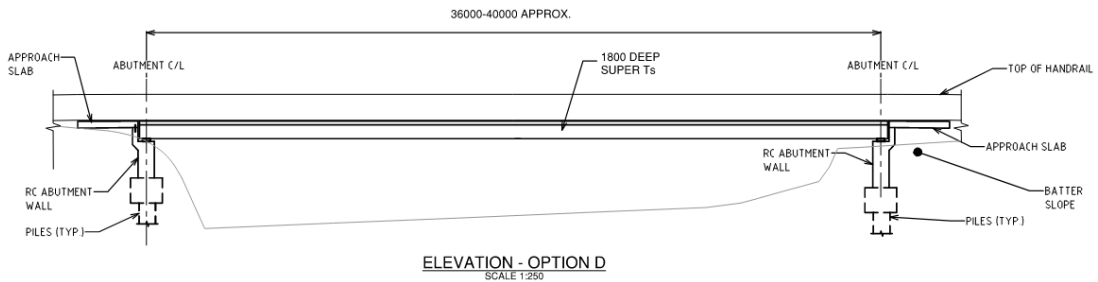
Edwards Bridge Renewal: Option D – Elevation
